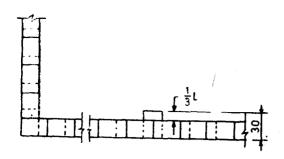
DETAILS OF BONDS IN STONE MASONARY BLOCK WALLING
